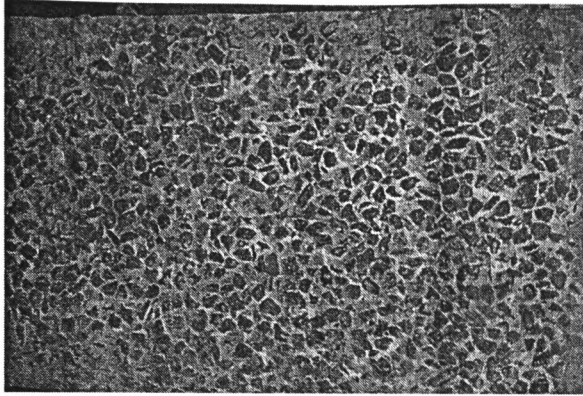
Concrete slab impregnated with 40 mm angular stones
